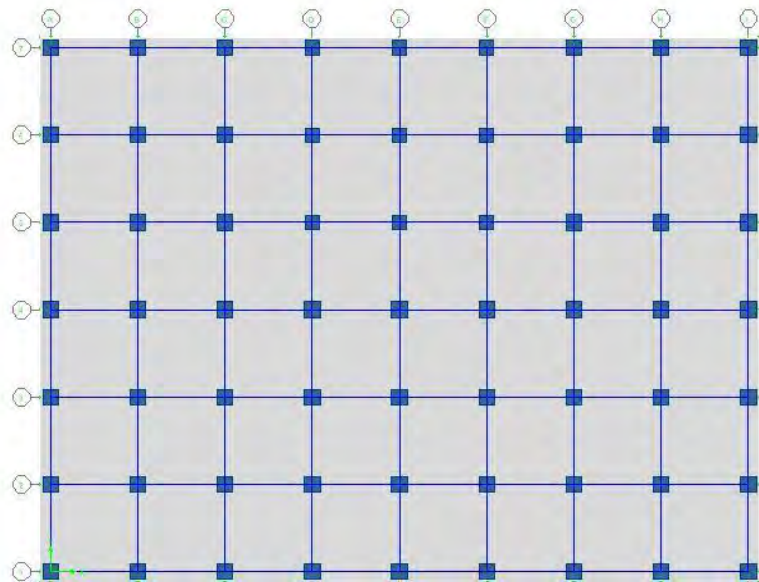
Column, beam and slab of non-uniform structure from Basement-3 to story 7.
